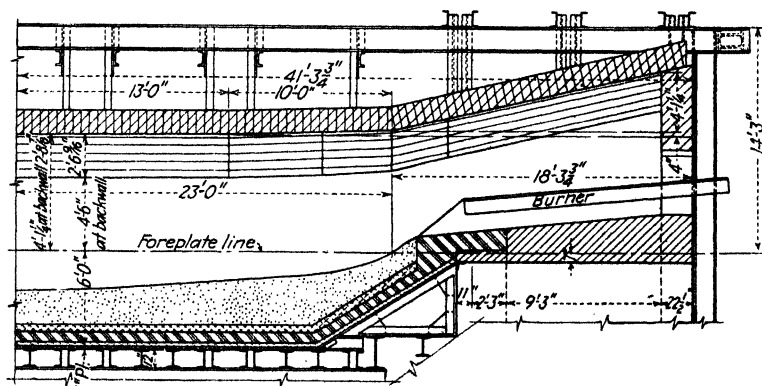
III.—Longitudinal sectional elevation through the center of the hearth.
